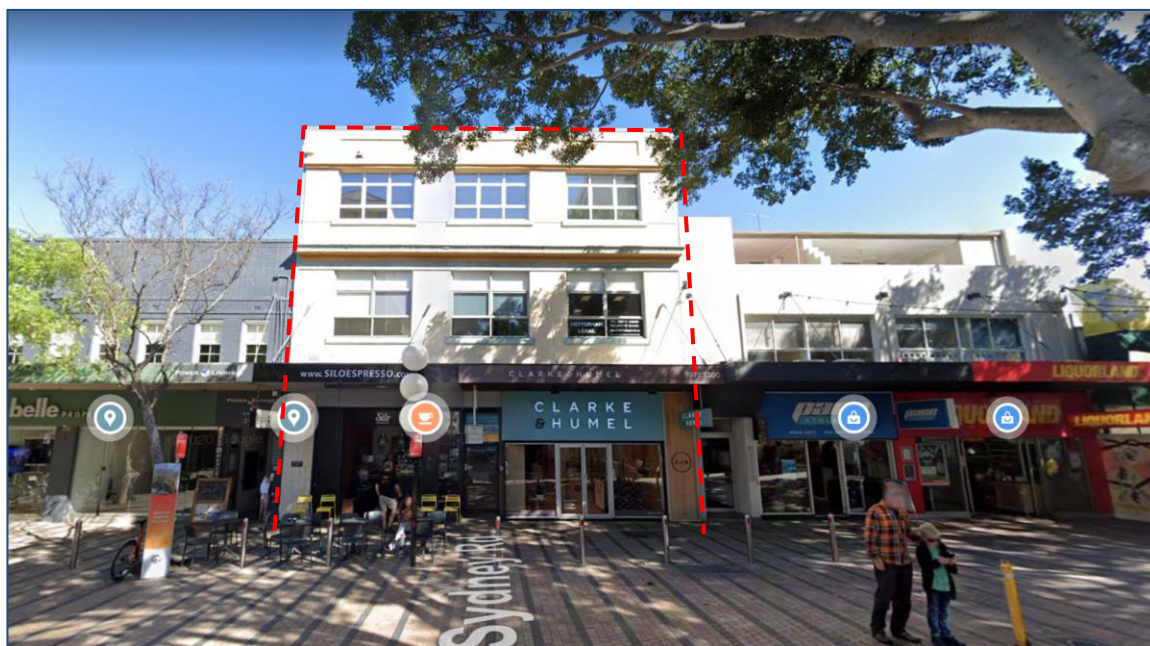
Existing site as viewed from the street (Google Maps, accessed 2023)
